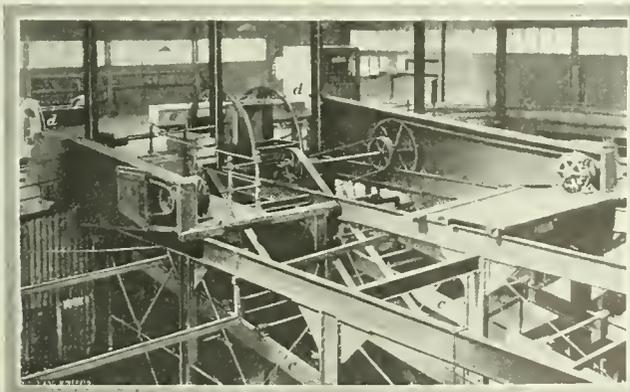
MOTORS DRIVING TIPPIE MACHINERY
